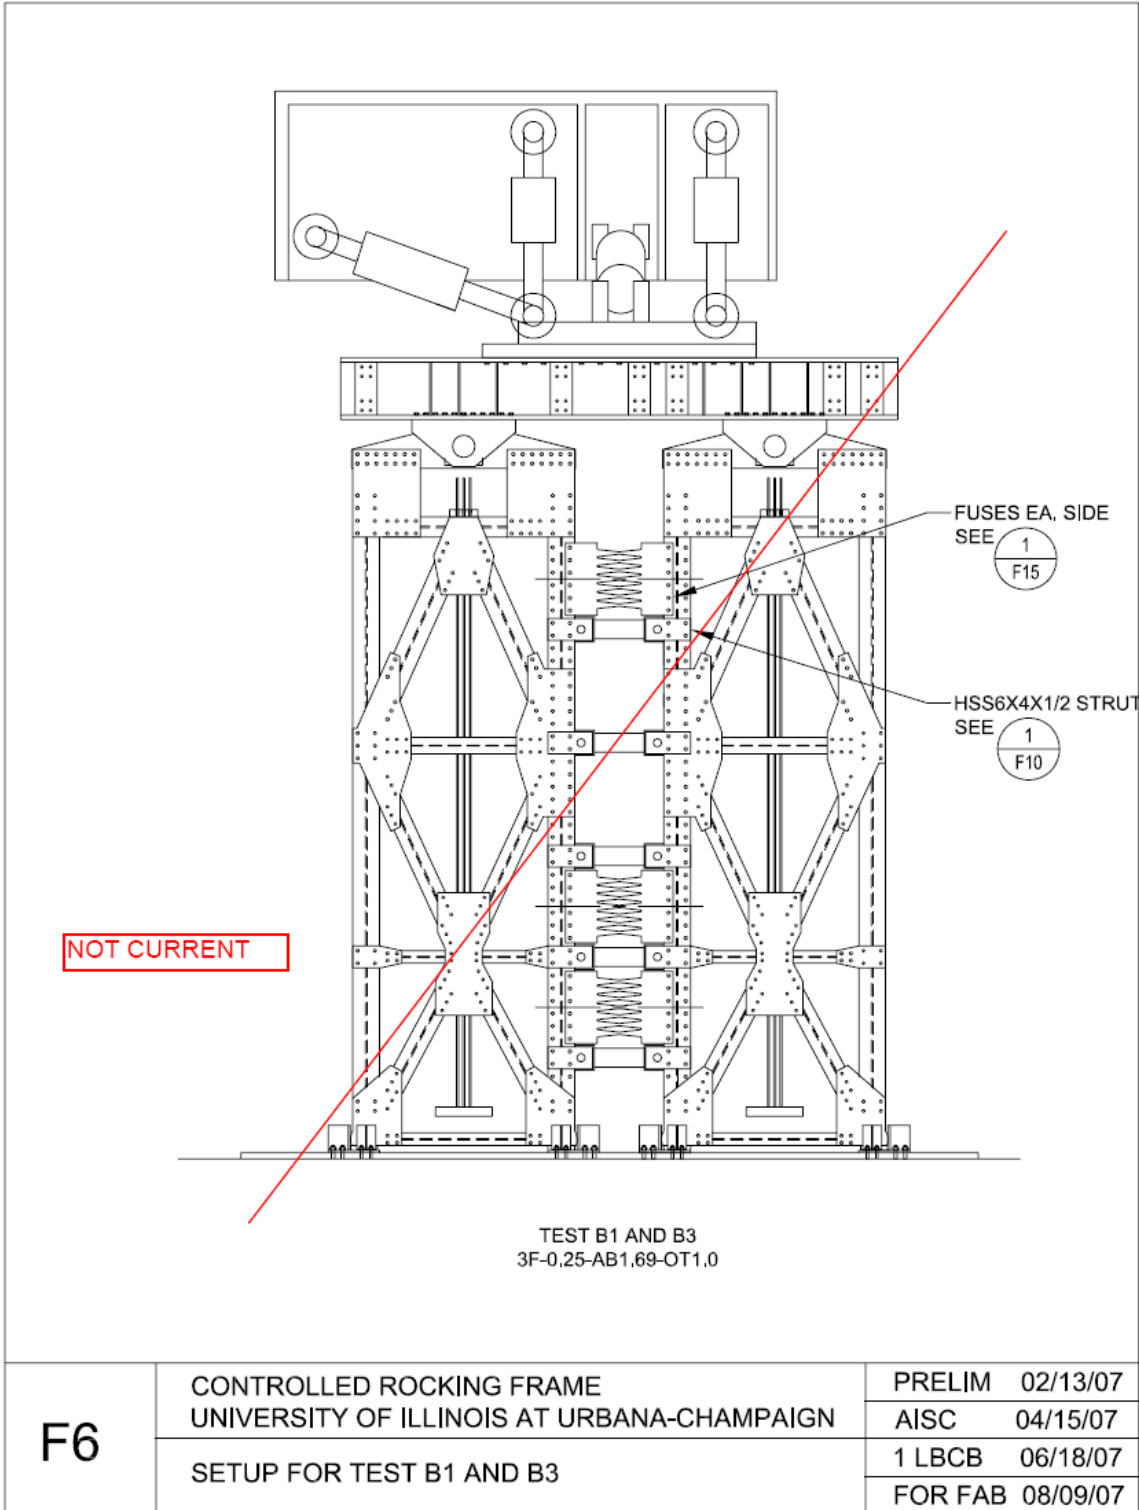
Specimen Design Drawing – Setup for Test B1 and B3
